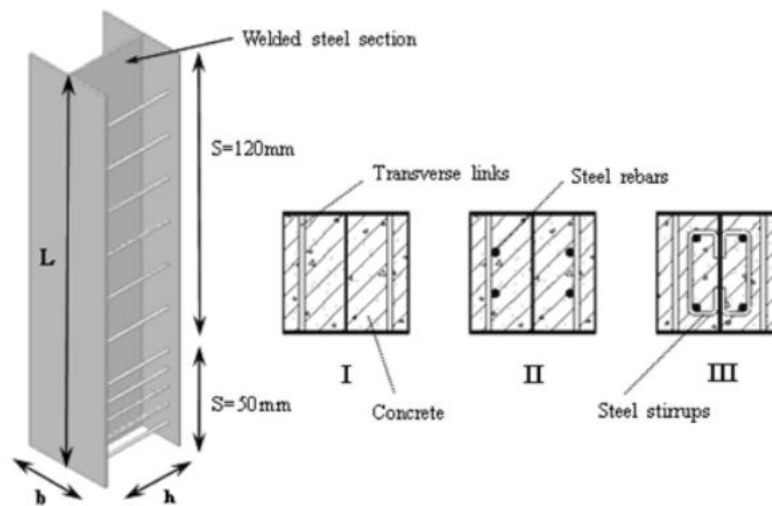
1 Cross-section of specimens and construction detail (Chen, et al., 2010)
